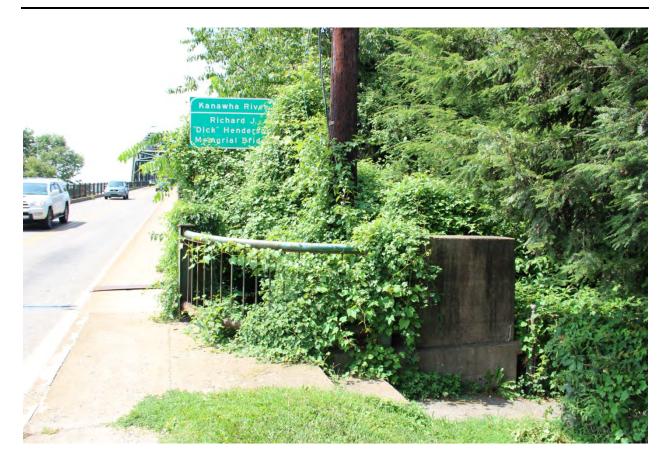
DETAIL OF SIDEWALK AND CURVED HANDRAILING AND CONCRETE END POST ASSEMBLY ALONG NORTHWEST ELEVATION OF NORTHEAST APPROACH, FACING SOUTHWEST.
